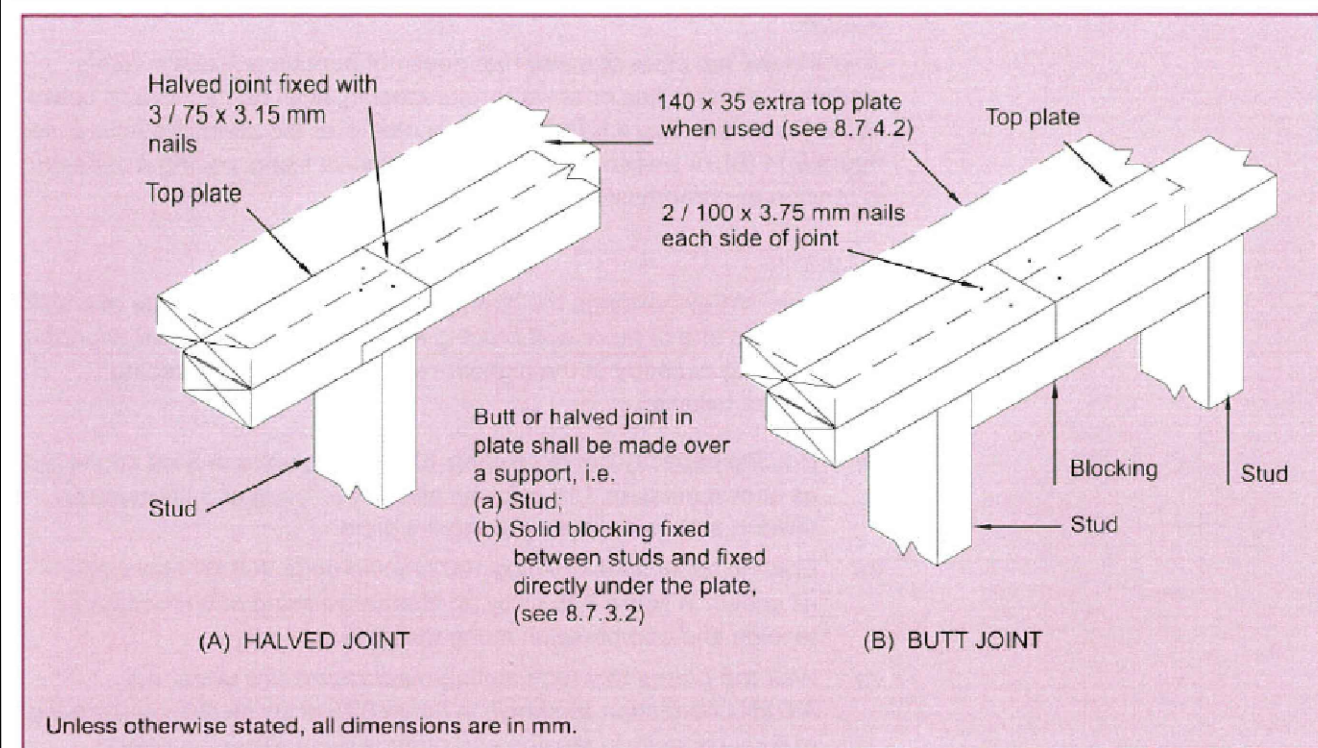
Connecting top plates – Walls not containing bracing (see 8.7.3.2)
